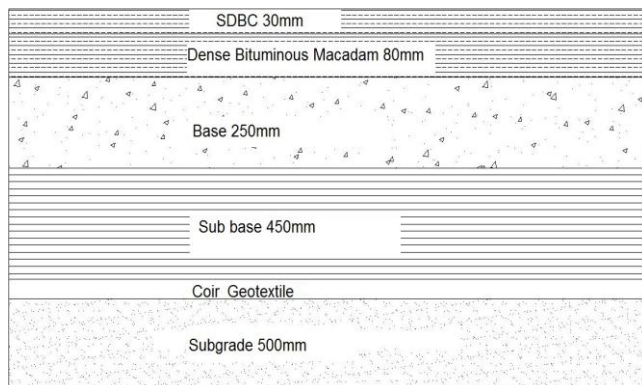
Pavement section with coir geotextile at interface of subgrade and subbase
